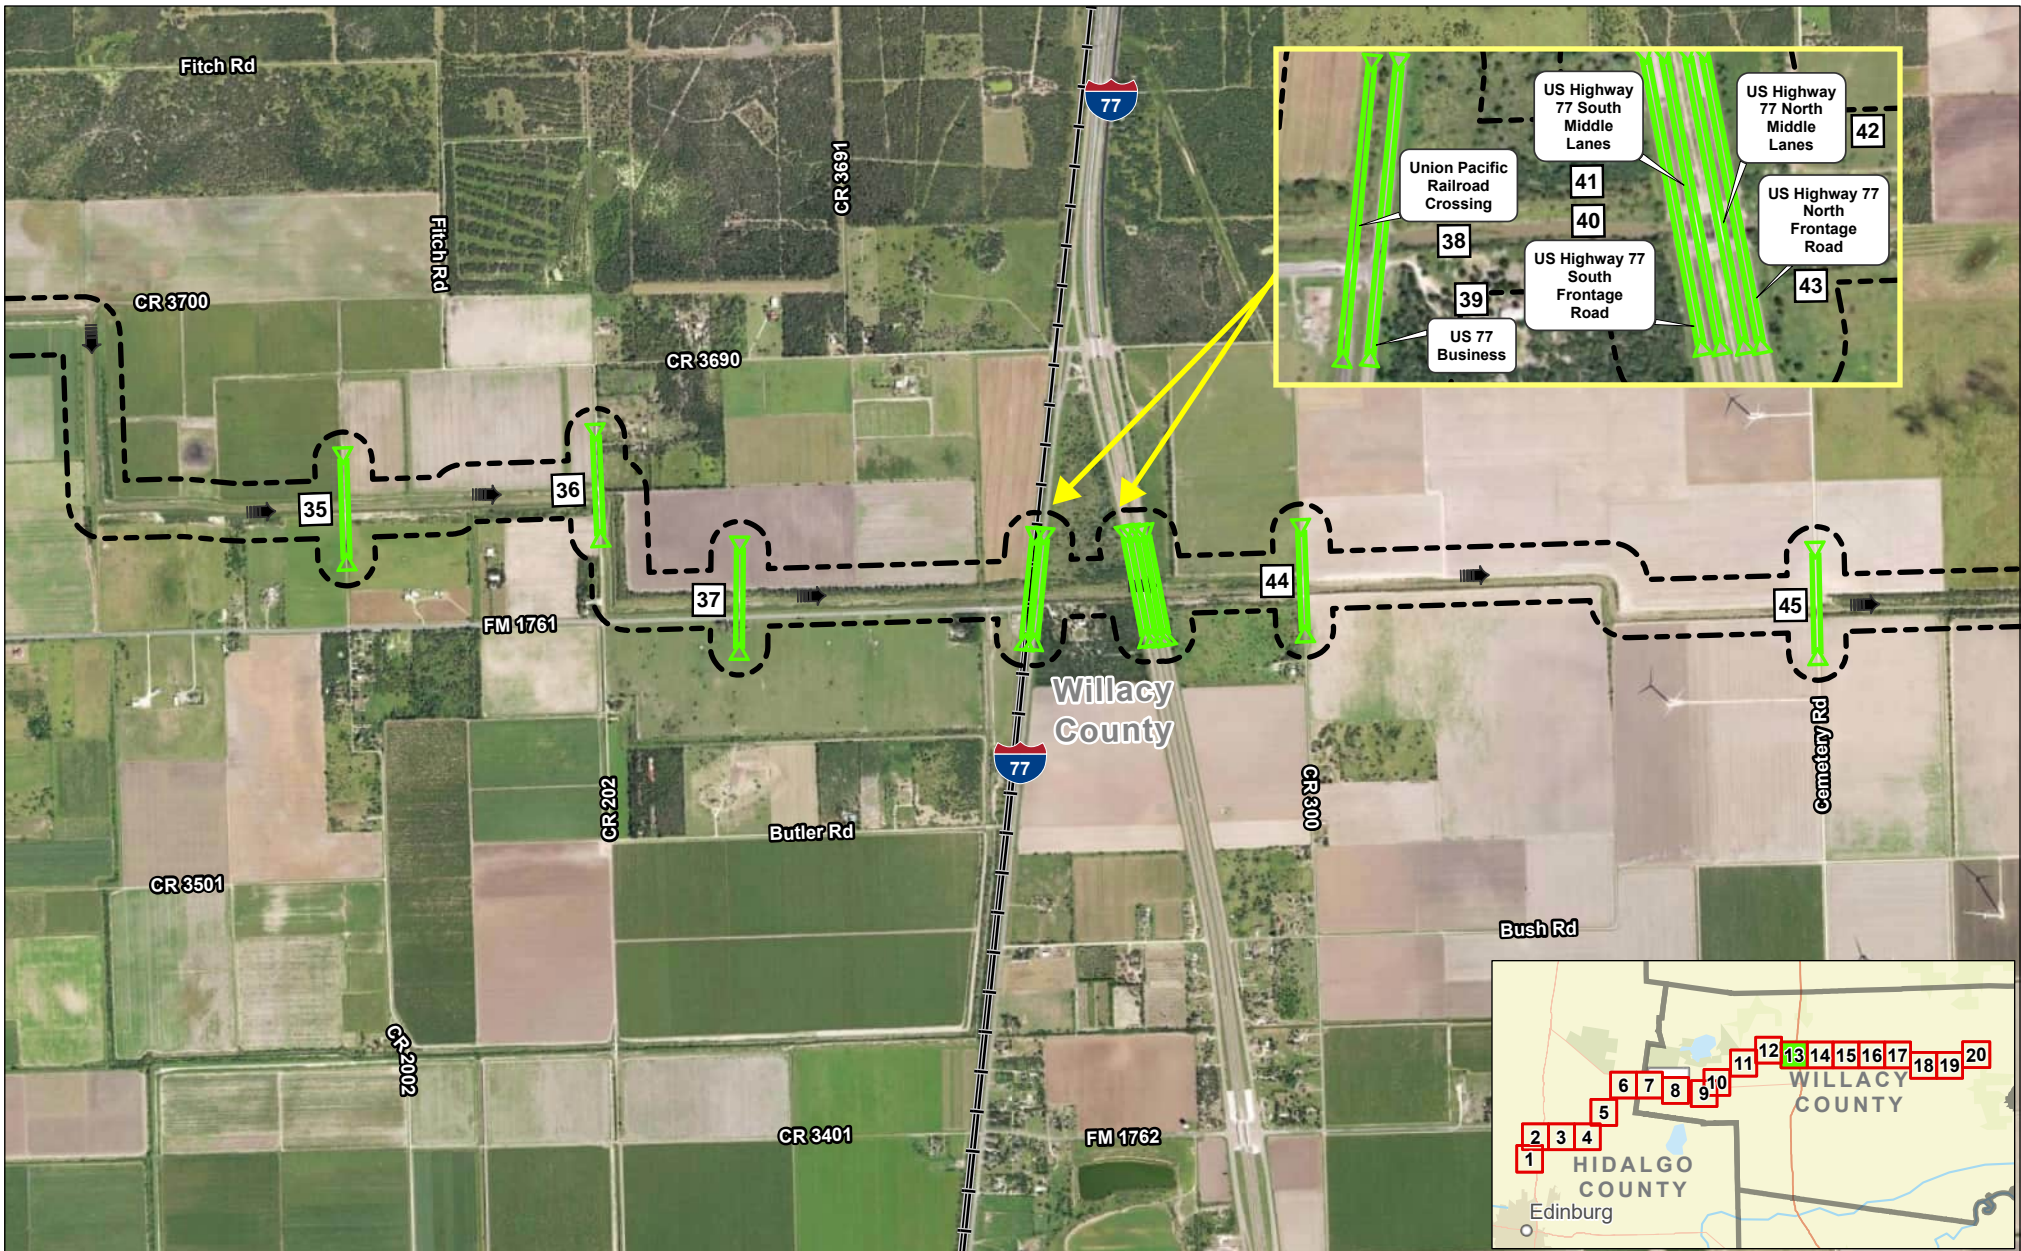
Alternative 1 Existing and Proposed Crossings Sheet 12 of 20 Raymondville Drain Project
